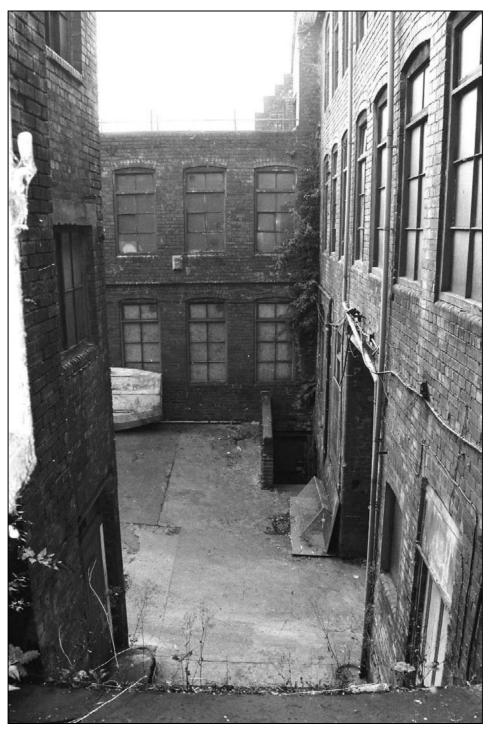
View across central yard from F3 towards north elevation of south range (west end) – note external staircase leading to basement (film 24.12)
